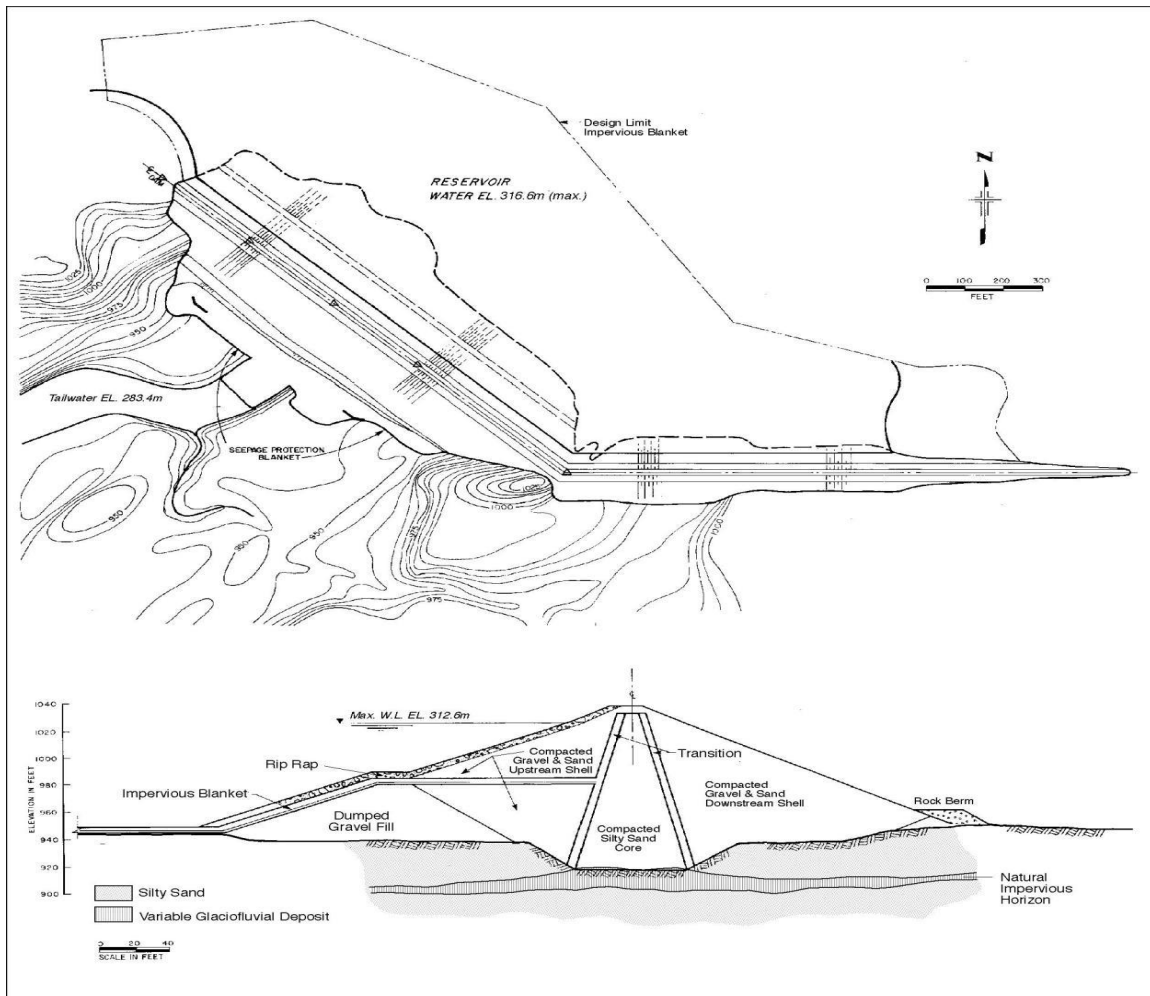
Shikwamkwa Dam: Section and plan showing the extent of upstream blanket, [10].
